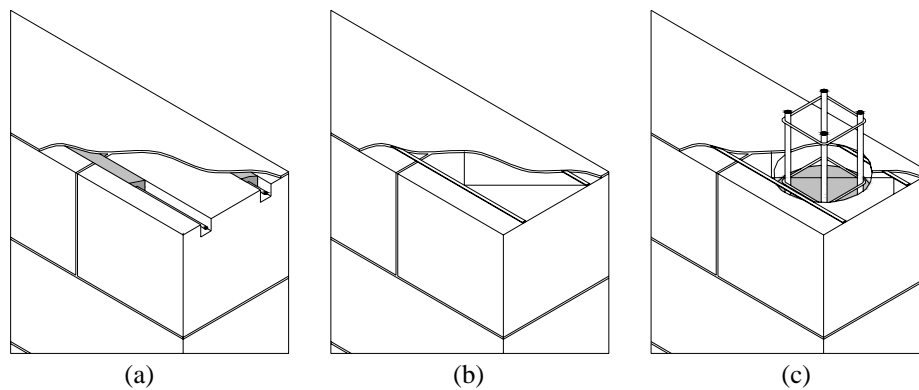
Construction details of the reinforced specimens: (a) horizontal rebars lodged in grooved blocks; (b) flat truss bed-joint reinforcement; flat truss reinforcement and cast in place confining r.c. columns.
